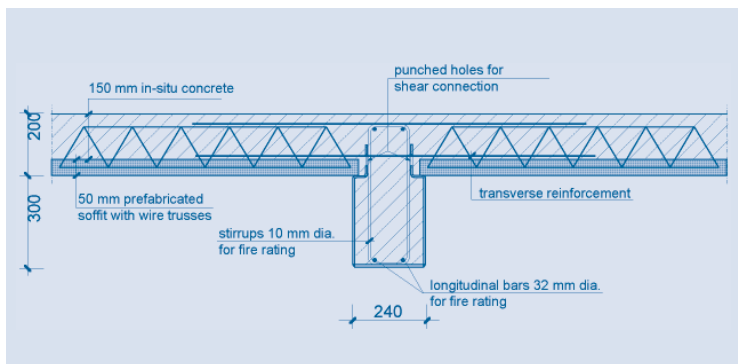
Typical cross-section of externally reinforced concrete T-beam
